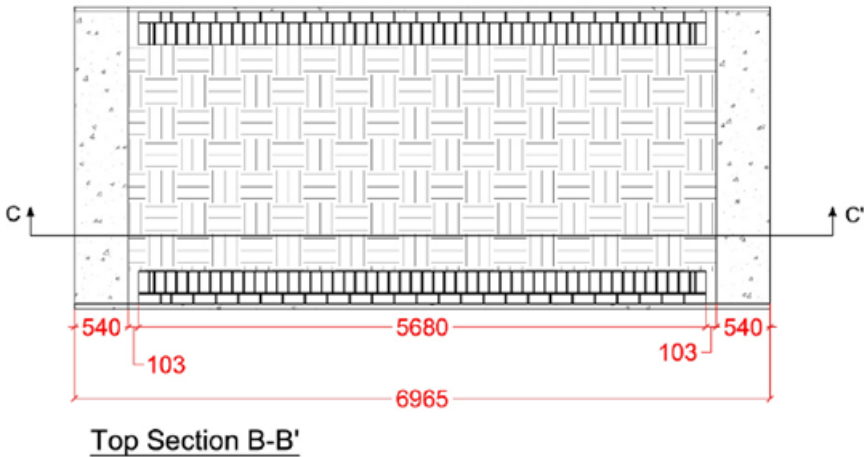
Dimensions of the test bridge section B-B' (mm) (Sarhosis et al., 2024)
